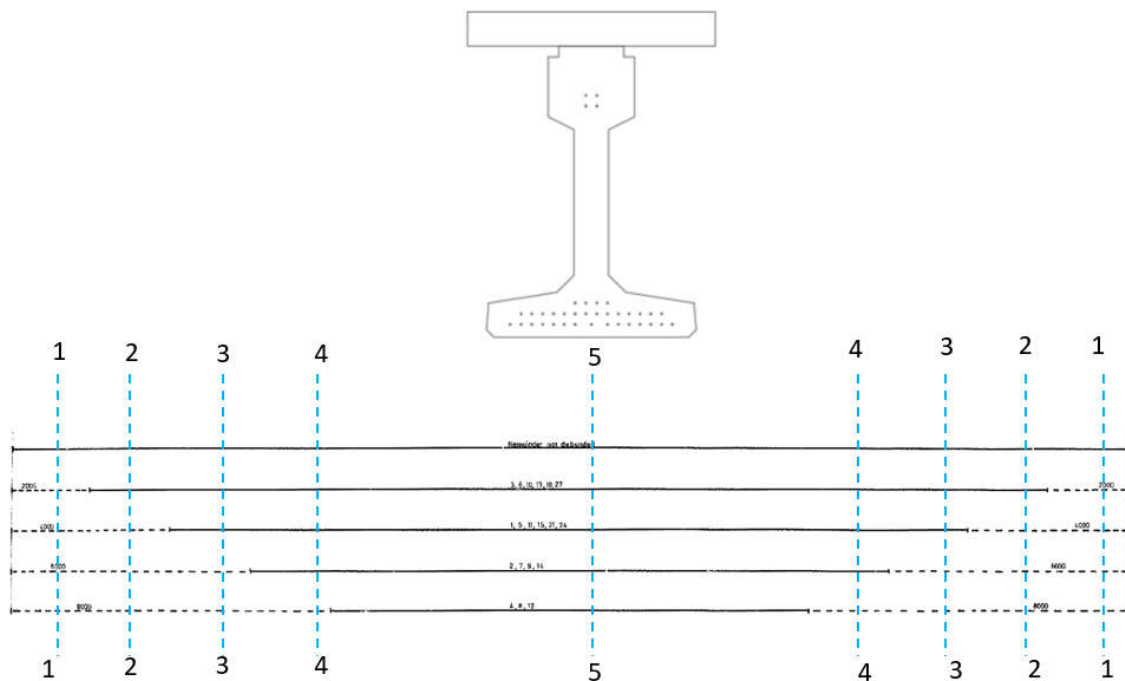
M-10 Beam Strand Layout and Debonding Details
